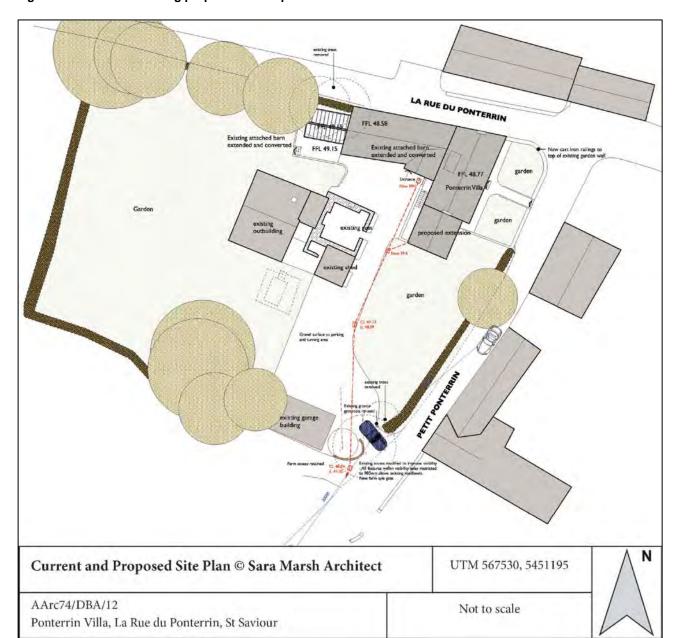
Site Plan including proposed development © Sara Marsh Architect Ltd
